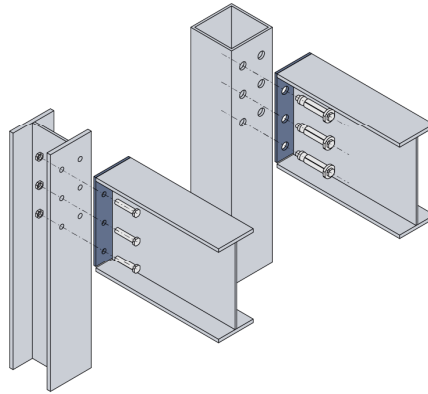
Endplate connection between an I-beam and an open section and a hollow section column [3]
